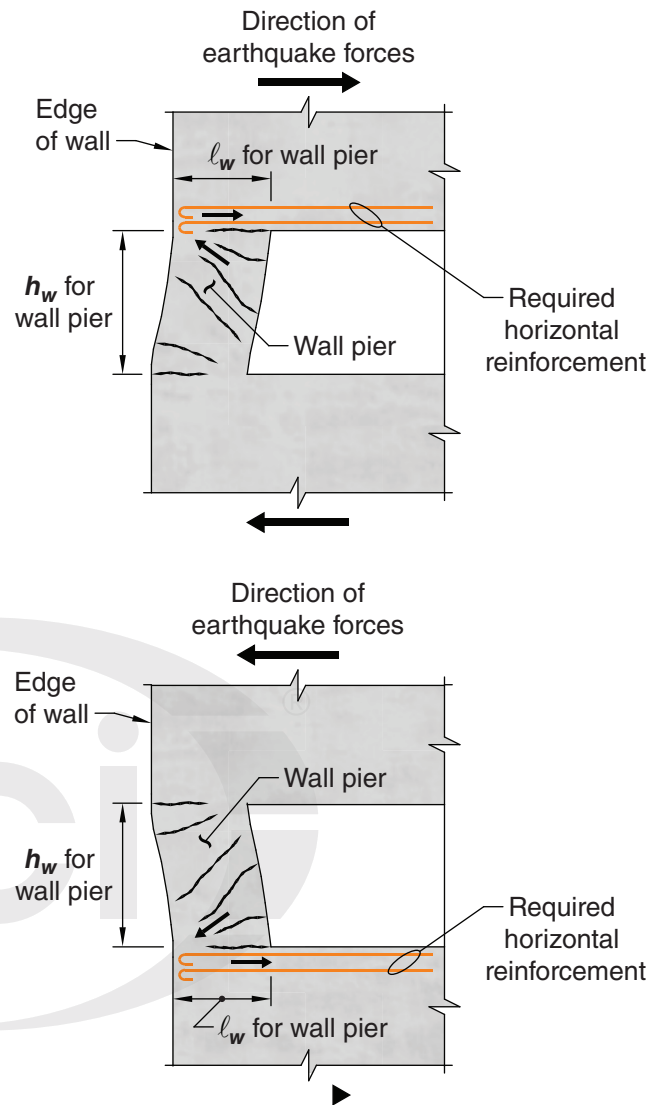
Required horizontal reinforcement in wall segments above and below wall piers at the edge of a wall.
